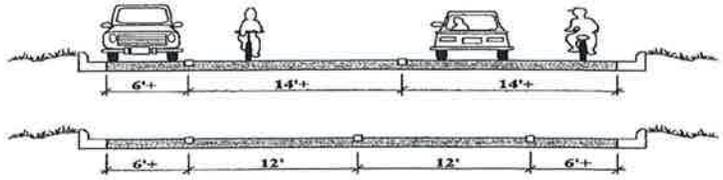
Restricting parking to one side and restriping streets provides additional space for both motorists and bicyclists.
